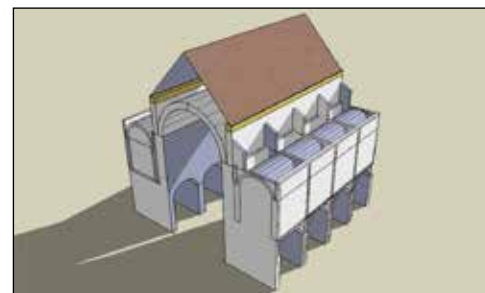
The nave ceiling was vaulted under the protection of the roofing.
